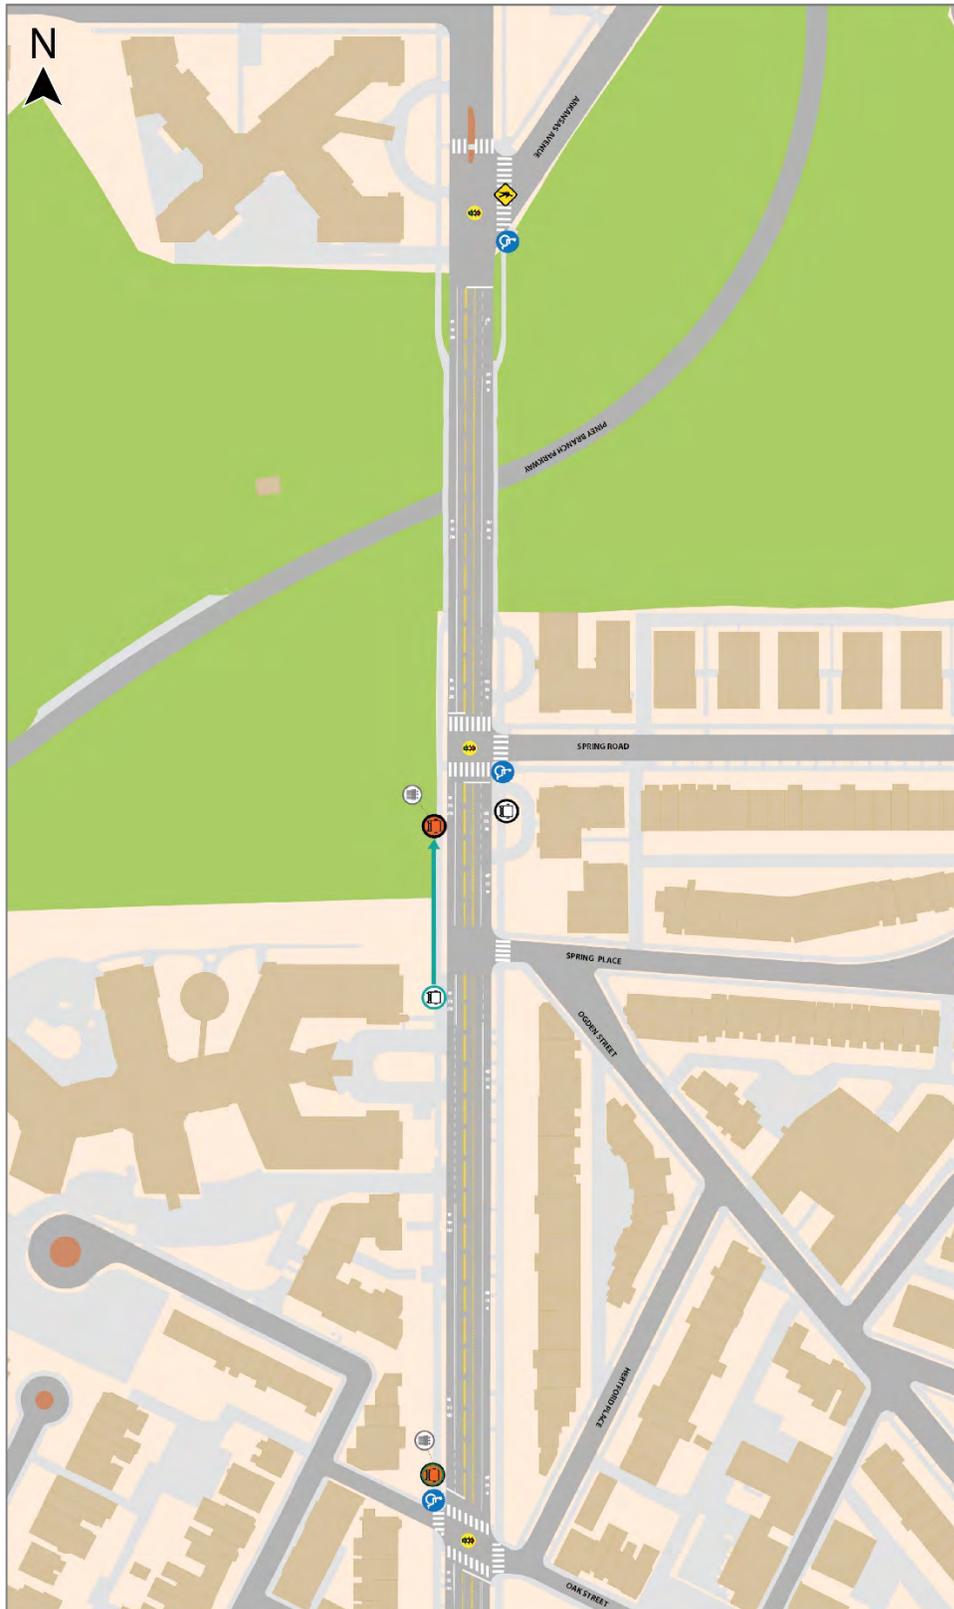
Recommended Improvements – Oak Street NW to Lamont Street NW
